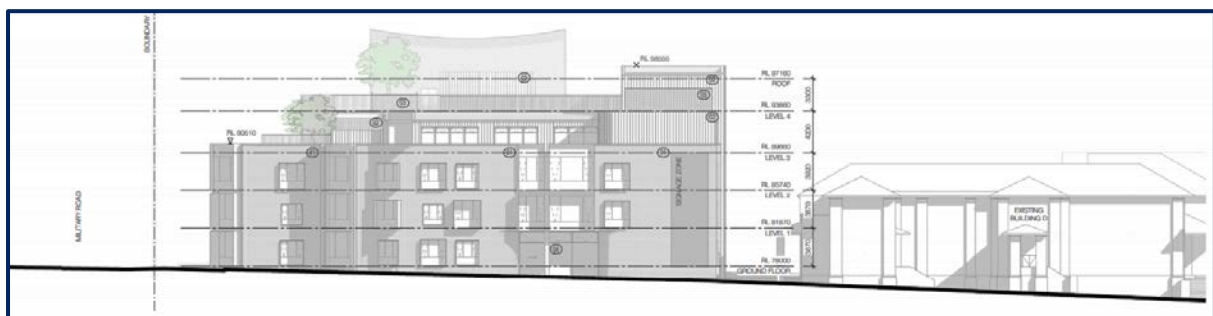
| Proposed Building G – northern elevation (Belmont Road) (Source: Applicant's RtS, 2021)
